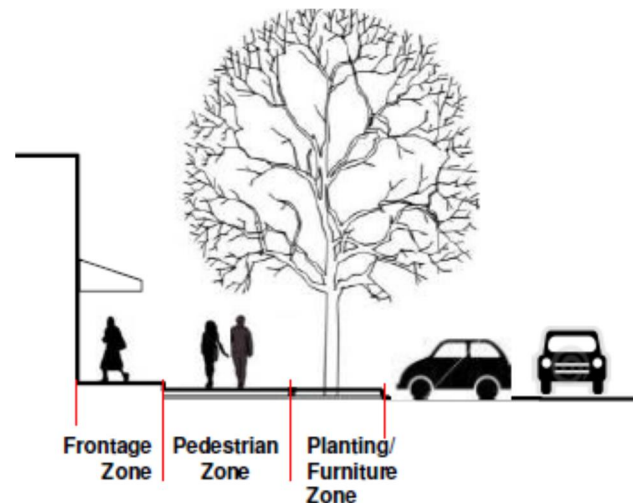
Picture showing the division of Footpath/ Sidewalk into 3 zones
